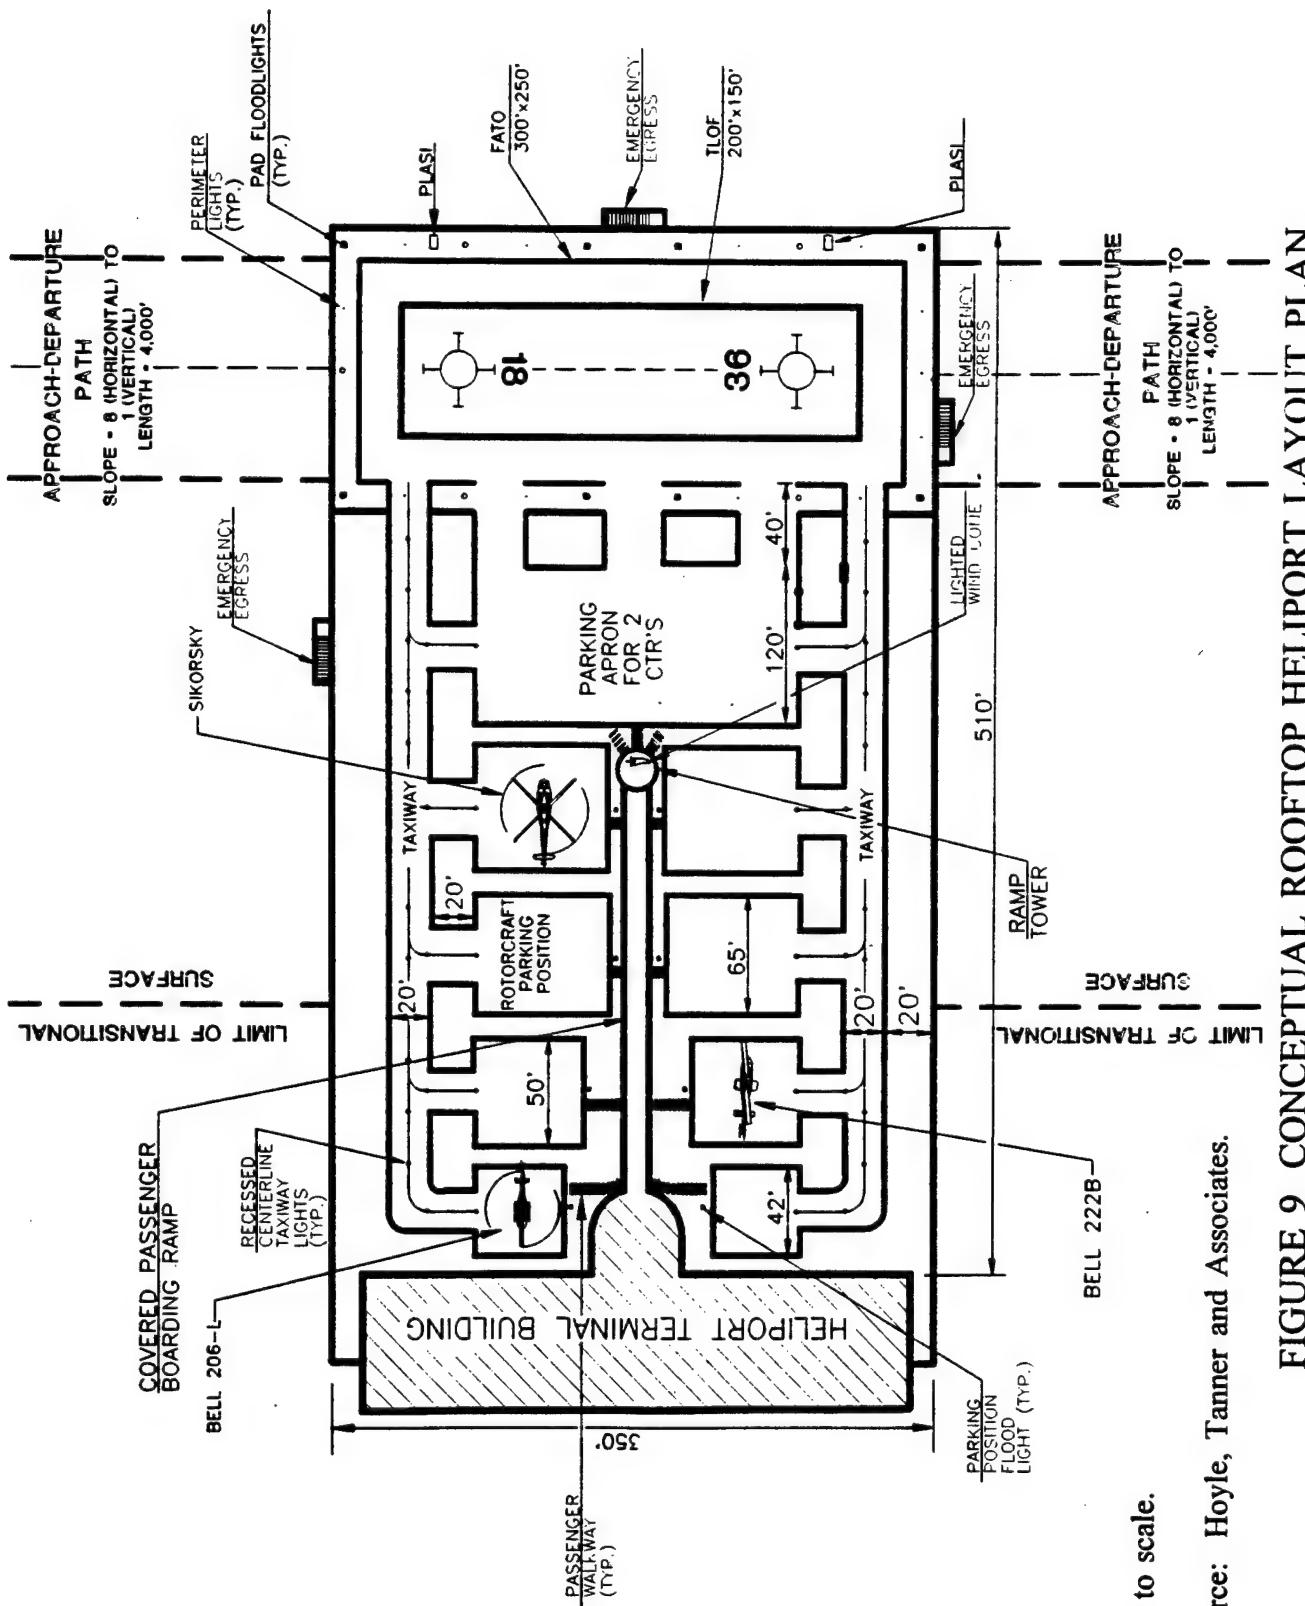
CONCEPTUAL ROOFTOP HELIPORT LAYOUT PLAN
